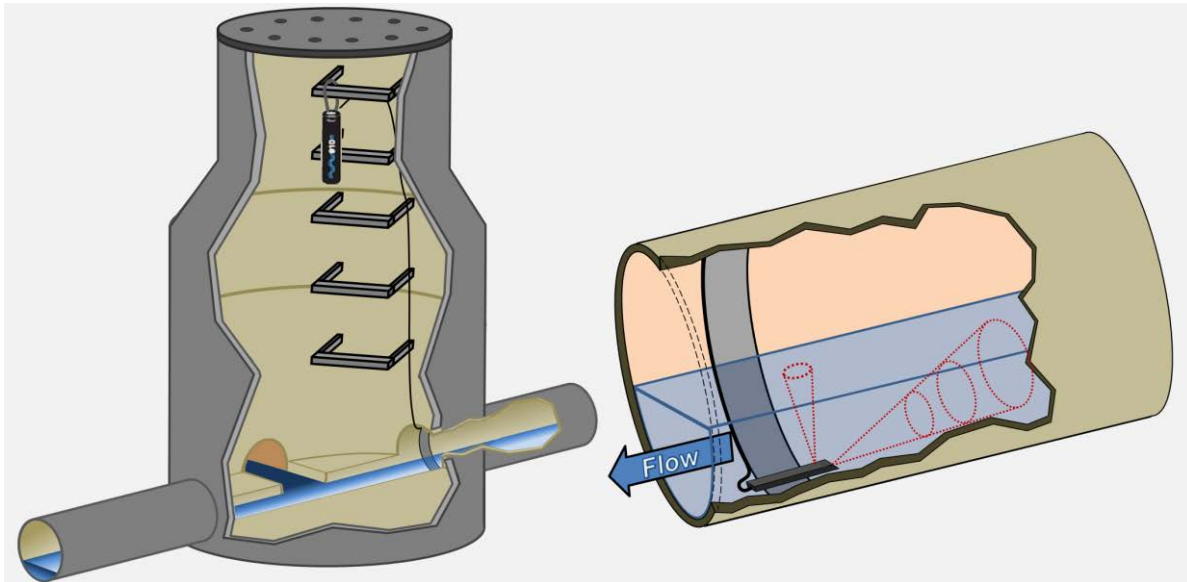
Typical Installation for Flow Meter with Submerged Sensor
